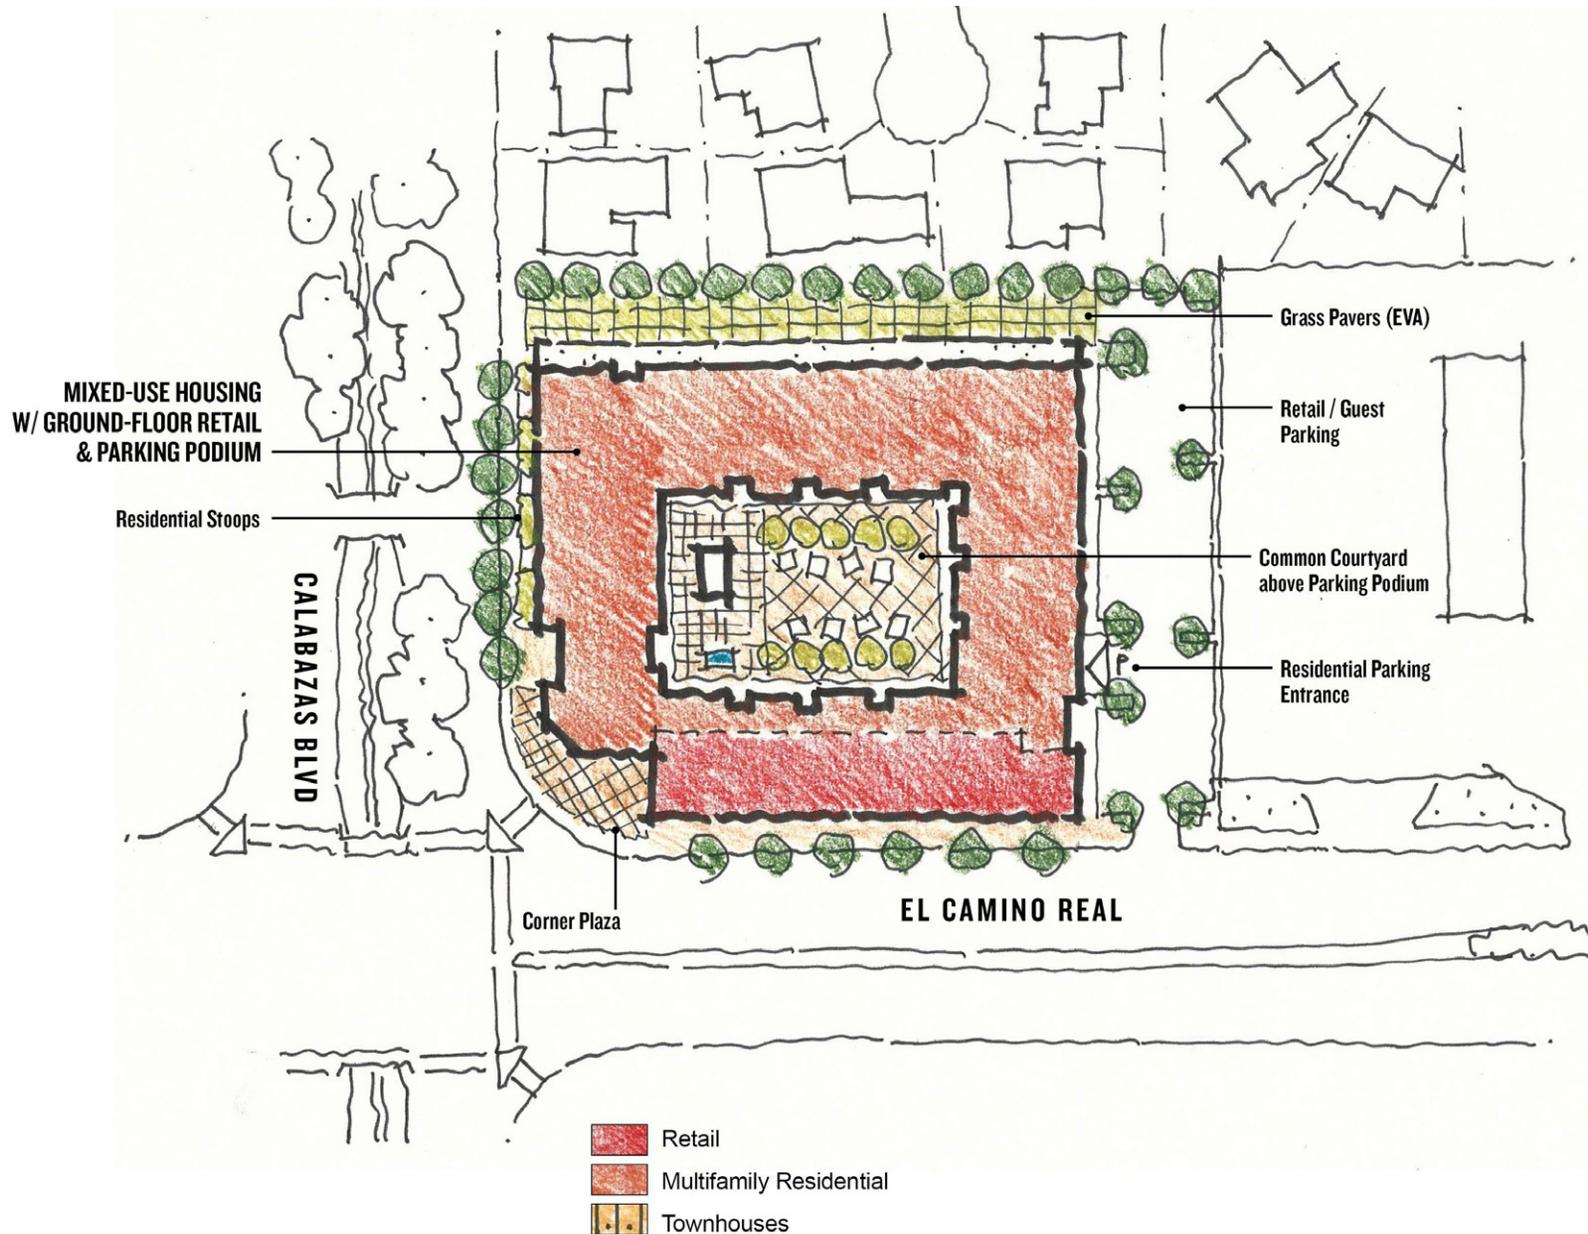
Corridor Mixed Use Conceptual Plan 1 Cross Section
